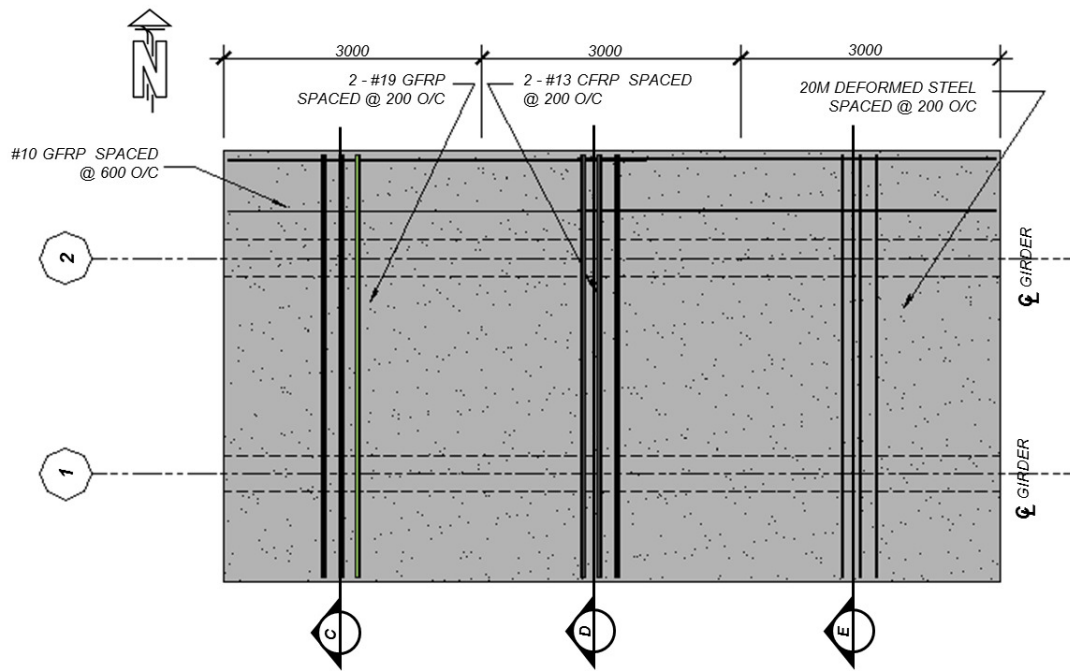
Plan view of un-stiffened cantilever slab overhang reinforcement (Klowak, 2007)
